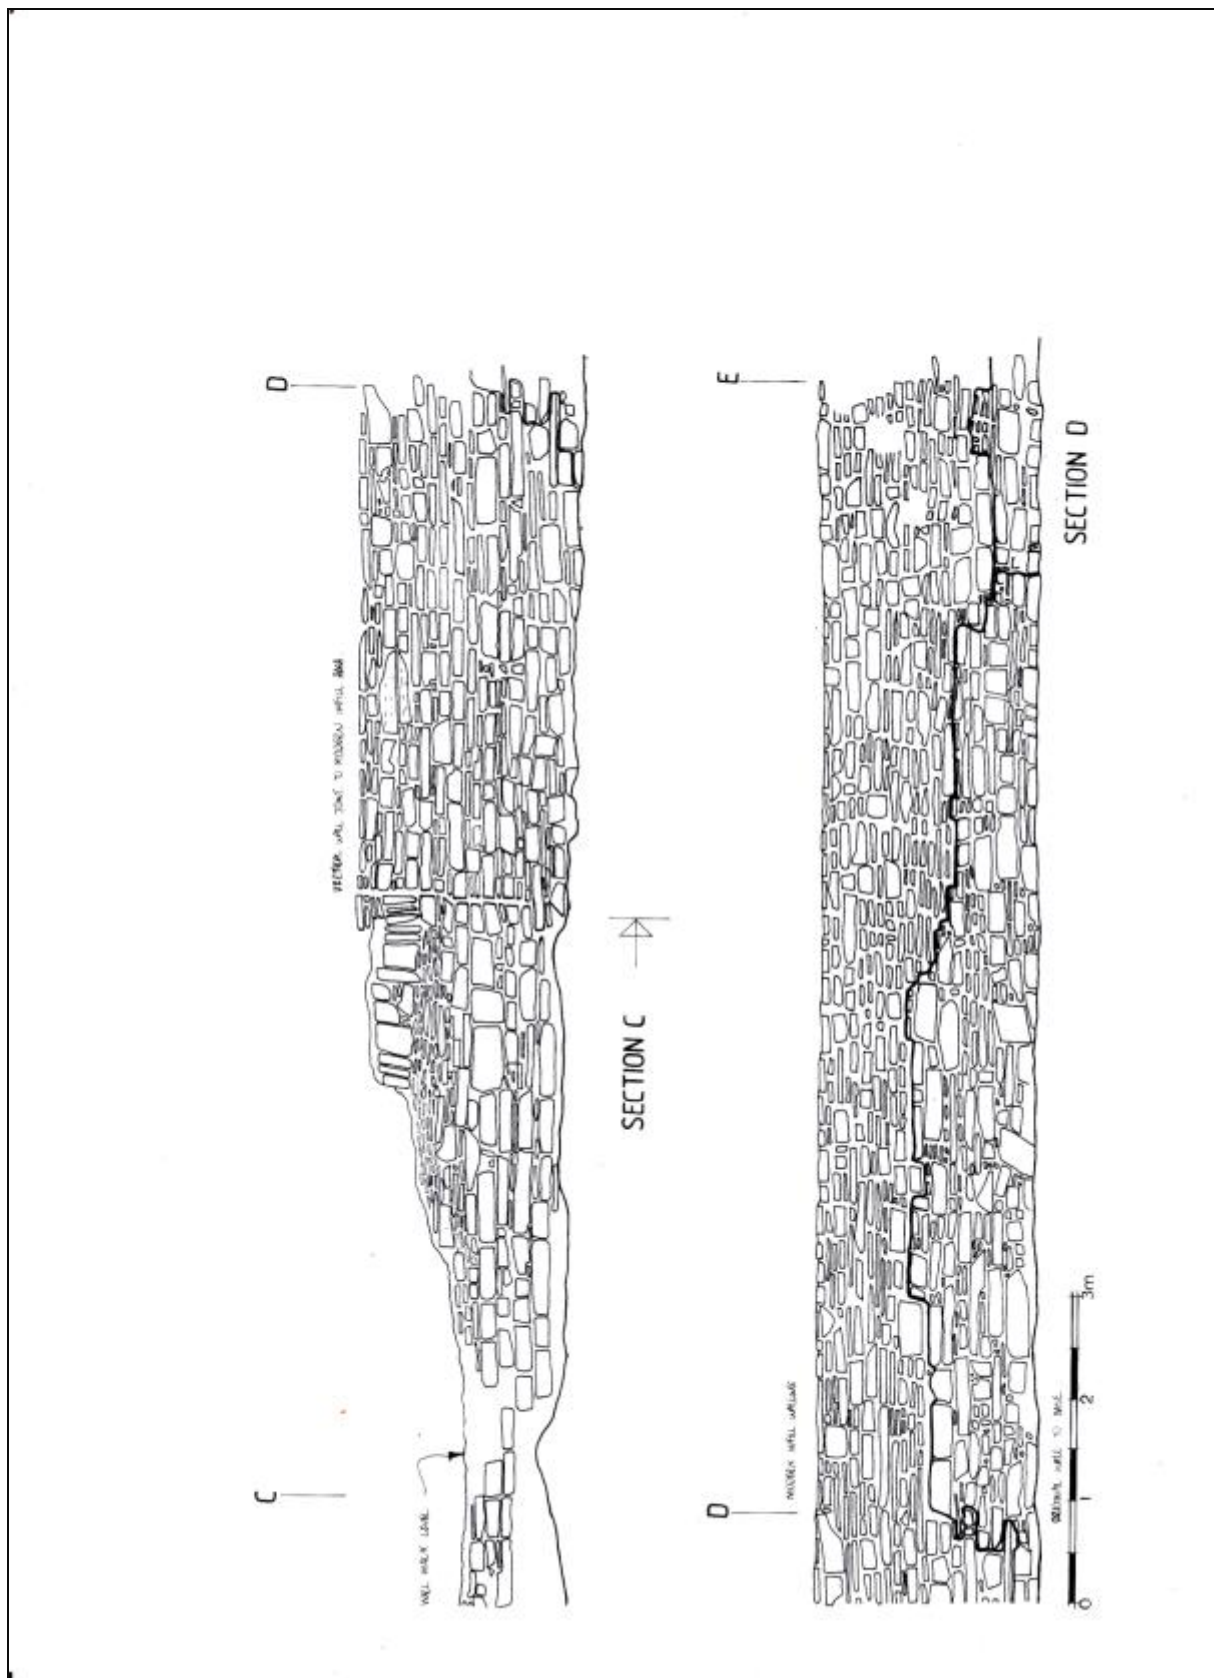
Continuation of west facing elevation (centre) of Section 2.
